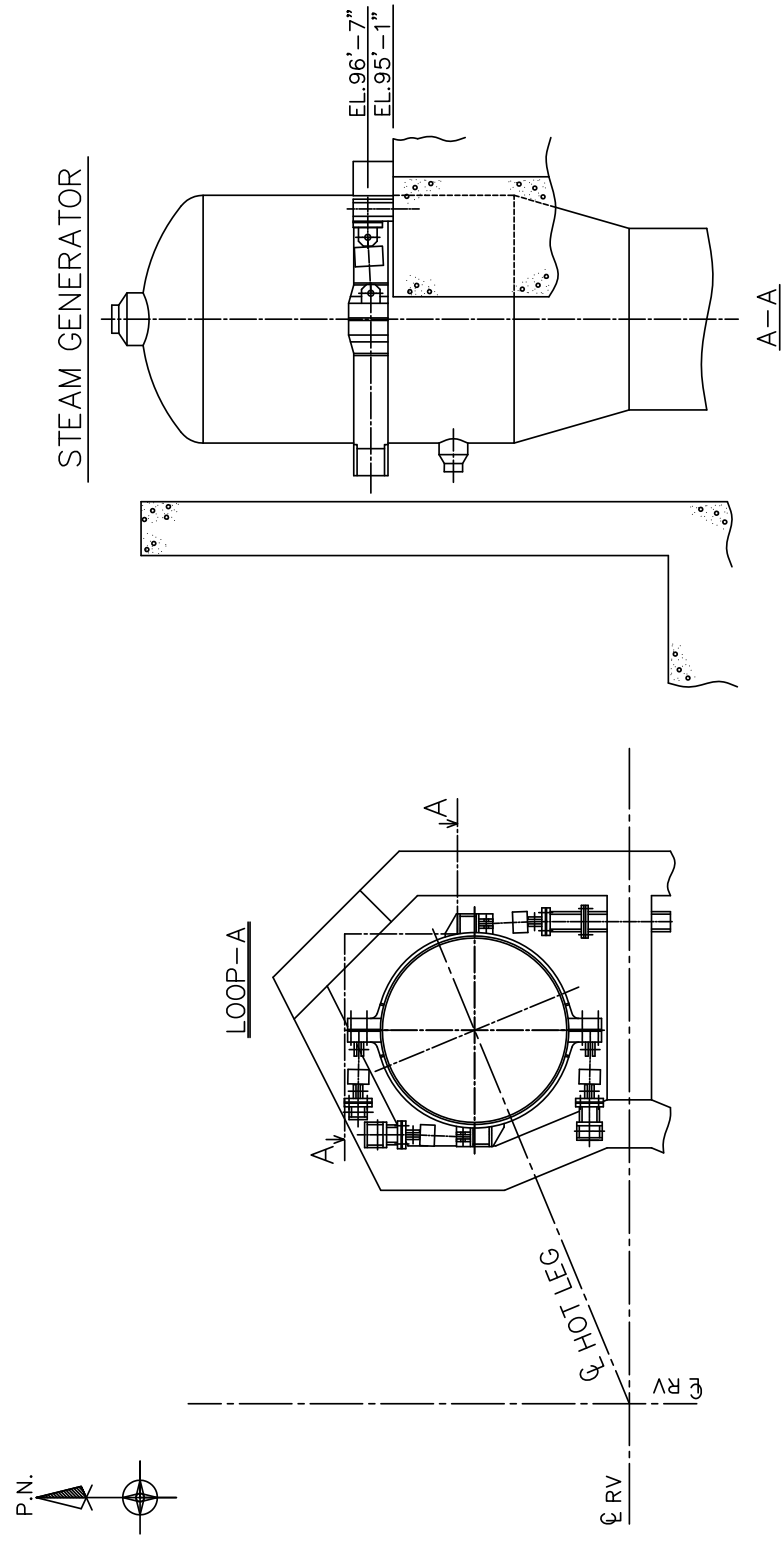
SG Support System (Sheet 1 of 4)
